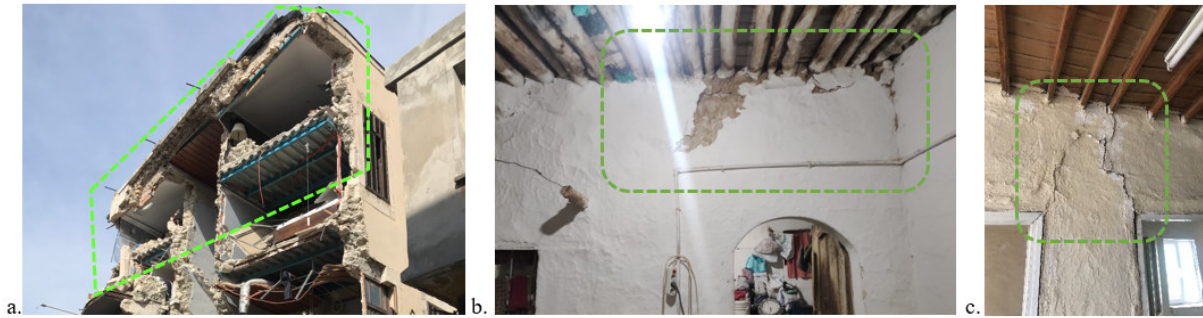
a. Roof/slab-to-wall connection failure b. Improper anchorage of timber joist in stone masonry c. Movement of timber joists
